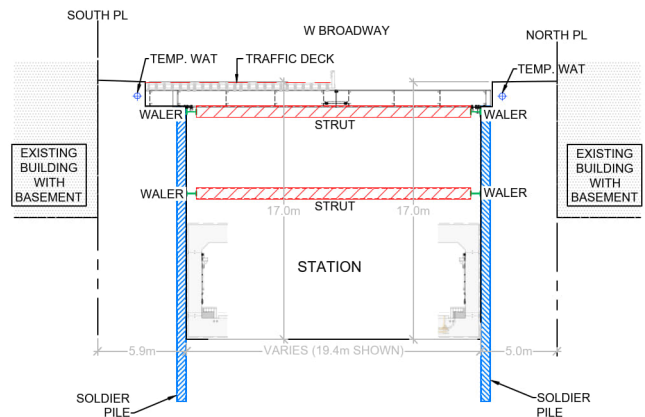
Elevation view of shoring solution for CMN5 abutment area in Zone 4
